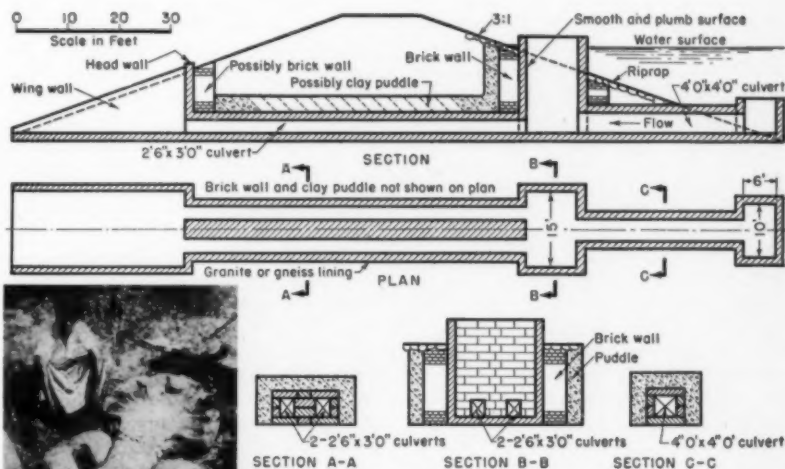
TYPICAL OUTLET WORKS for ancient reservoirs on Ceylon, dating back to 300-400 B. C., show careful design and construction details. Carved image of cobra (left) is found at many ancient outlets, apparently placed there as sacred guardian of the water.
